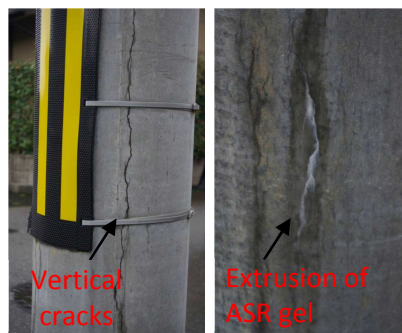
The cracking and ASR gel extrusion of electric utility pole
